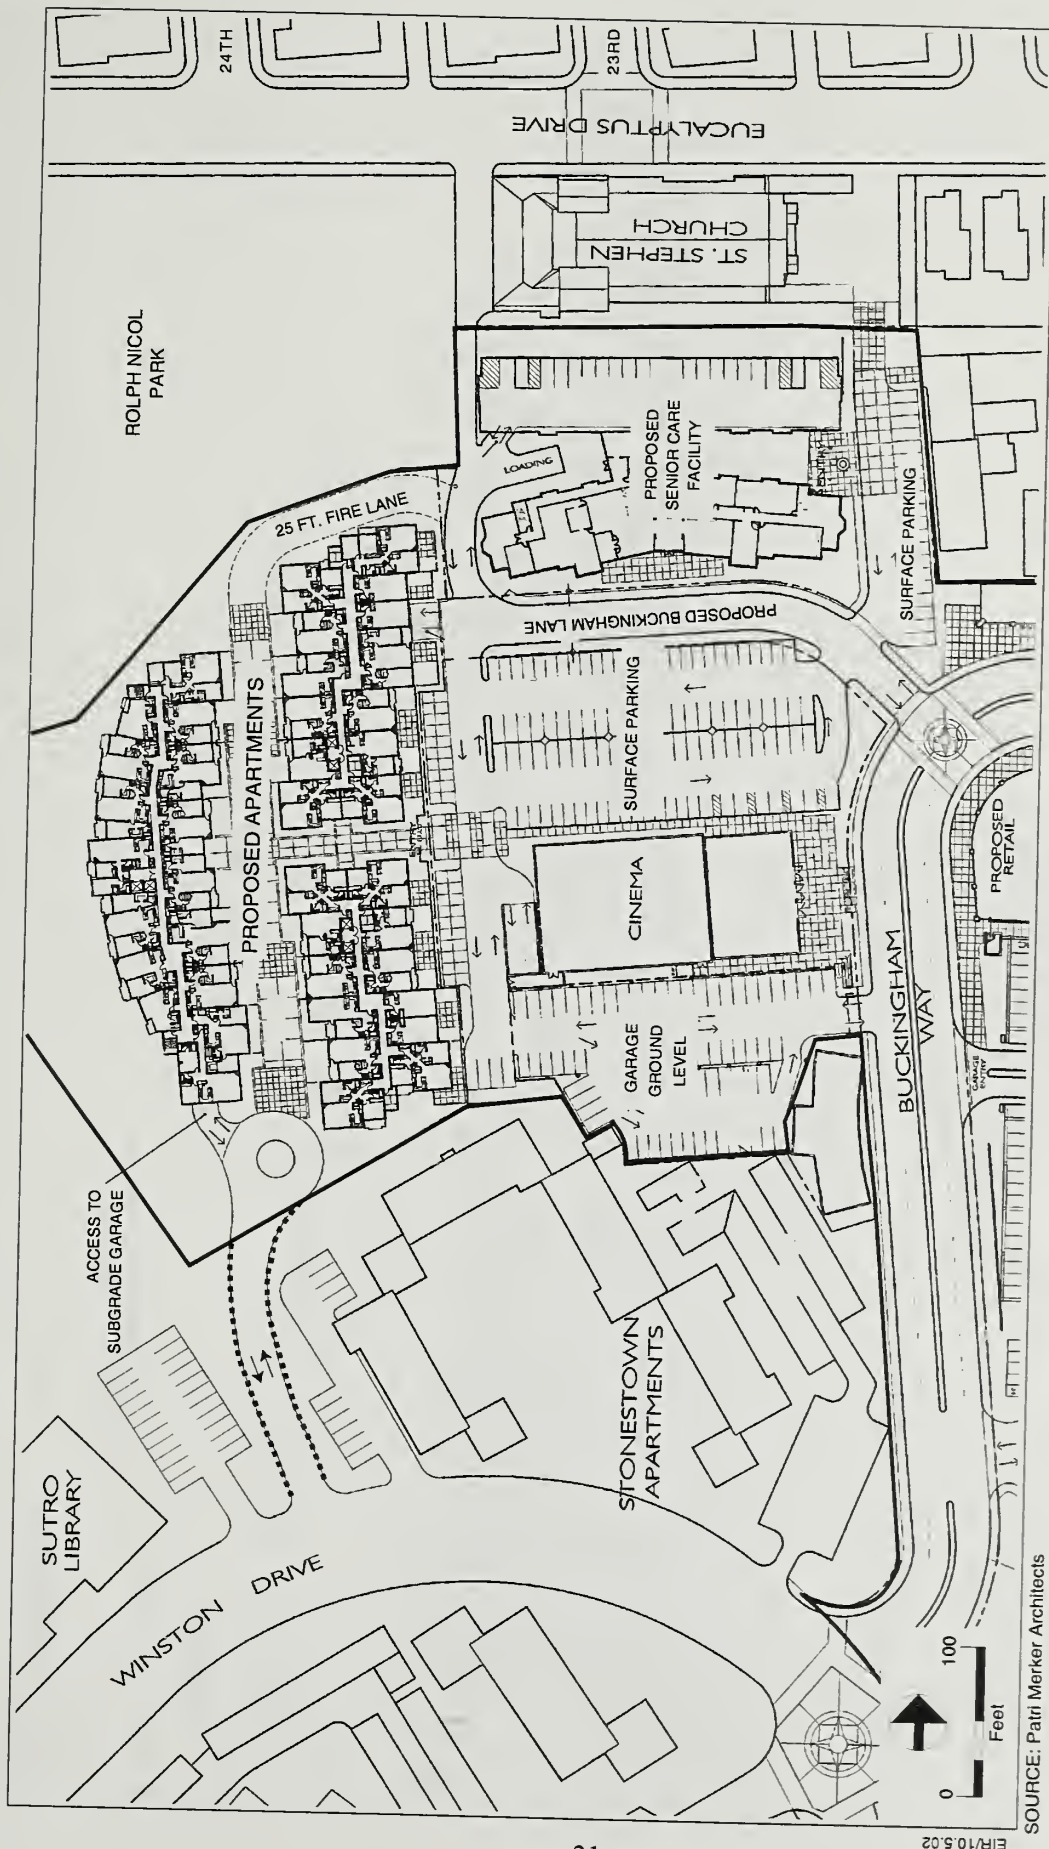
WEST OF BUCKINGHAM WAY AREA, FIRST-FLOOR PLAN
